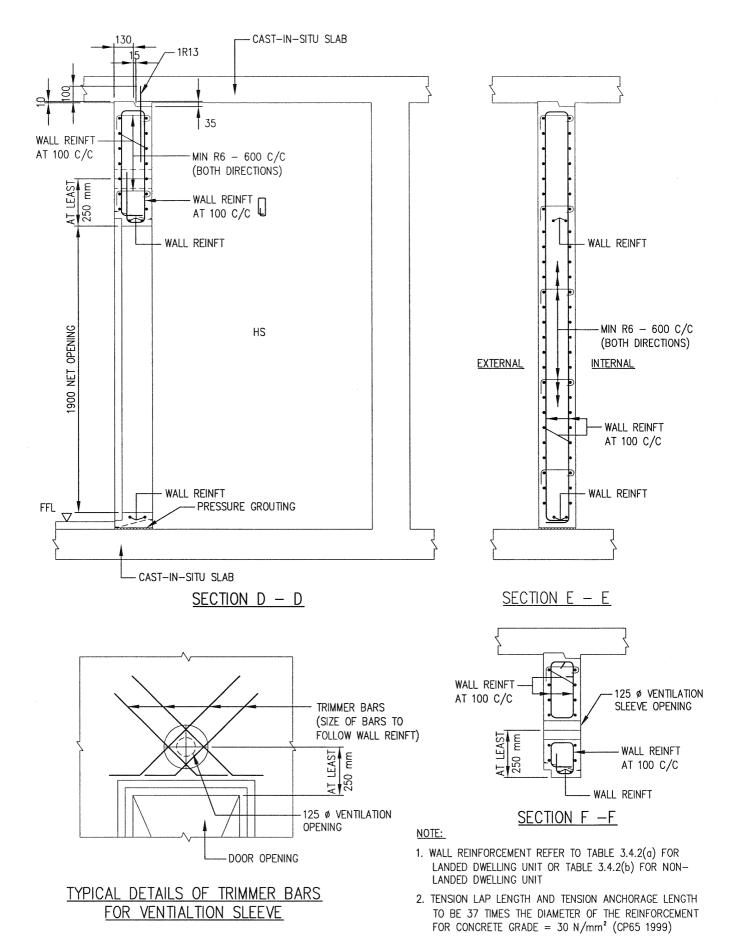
(q) DETAILS OF PRECAST HS DOOR FRAME PANEL (TYPE 3)
